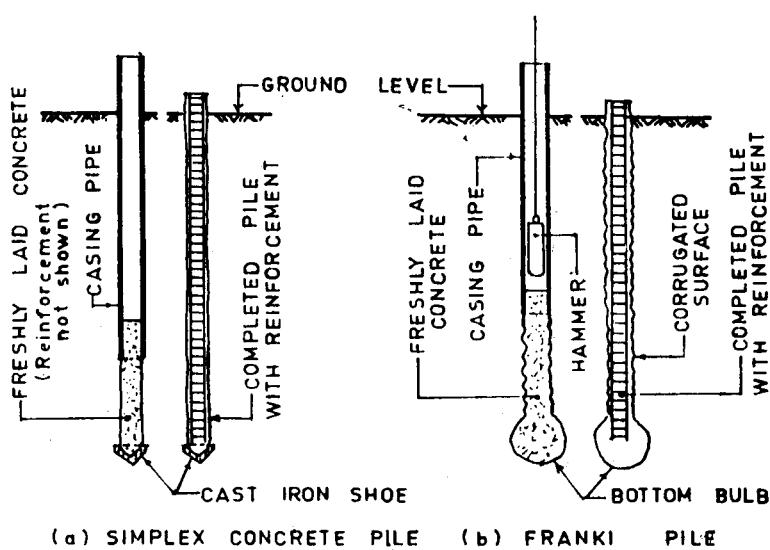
CAST-IN-SITU DRIVEN PILES
